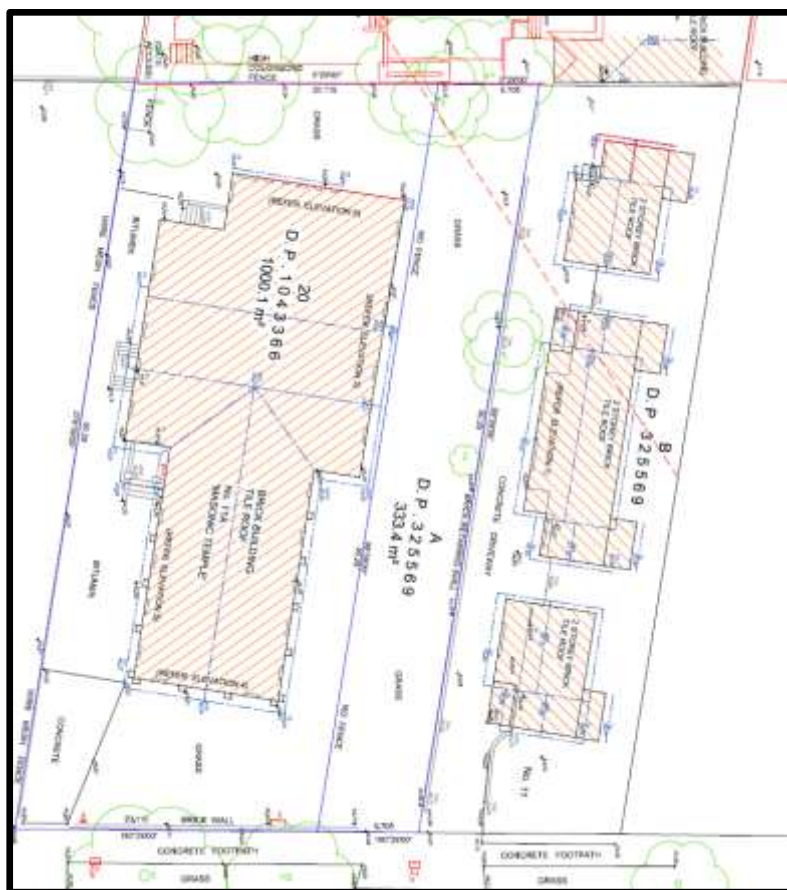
Survey plan showing the existing site conditions (courtesy: Project Surveyors, 2013)
